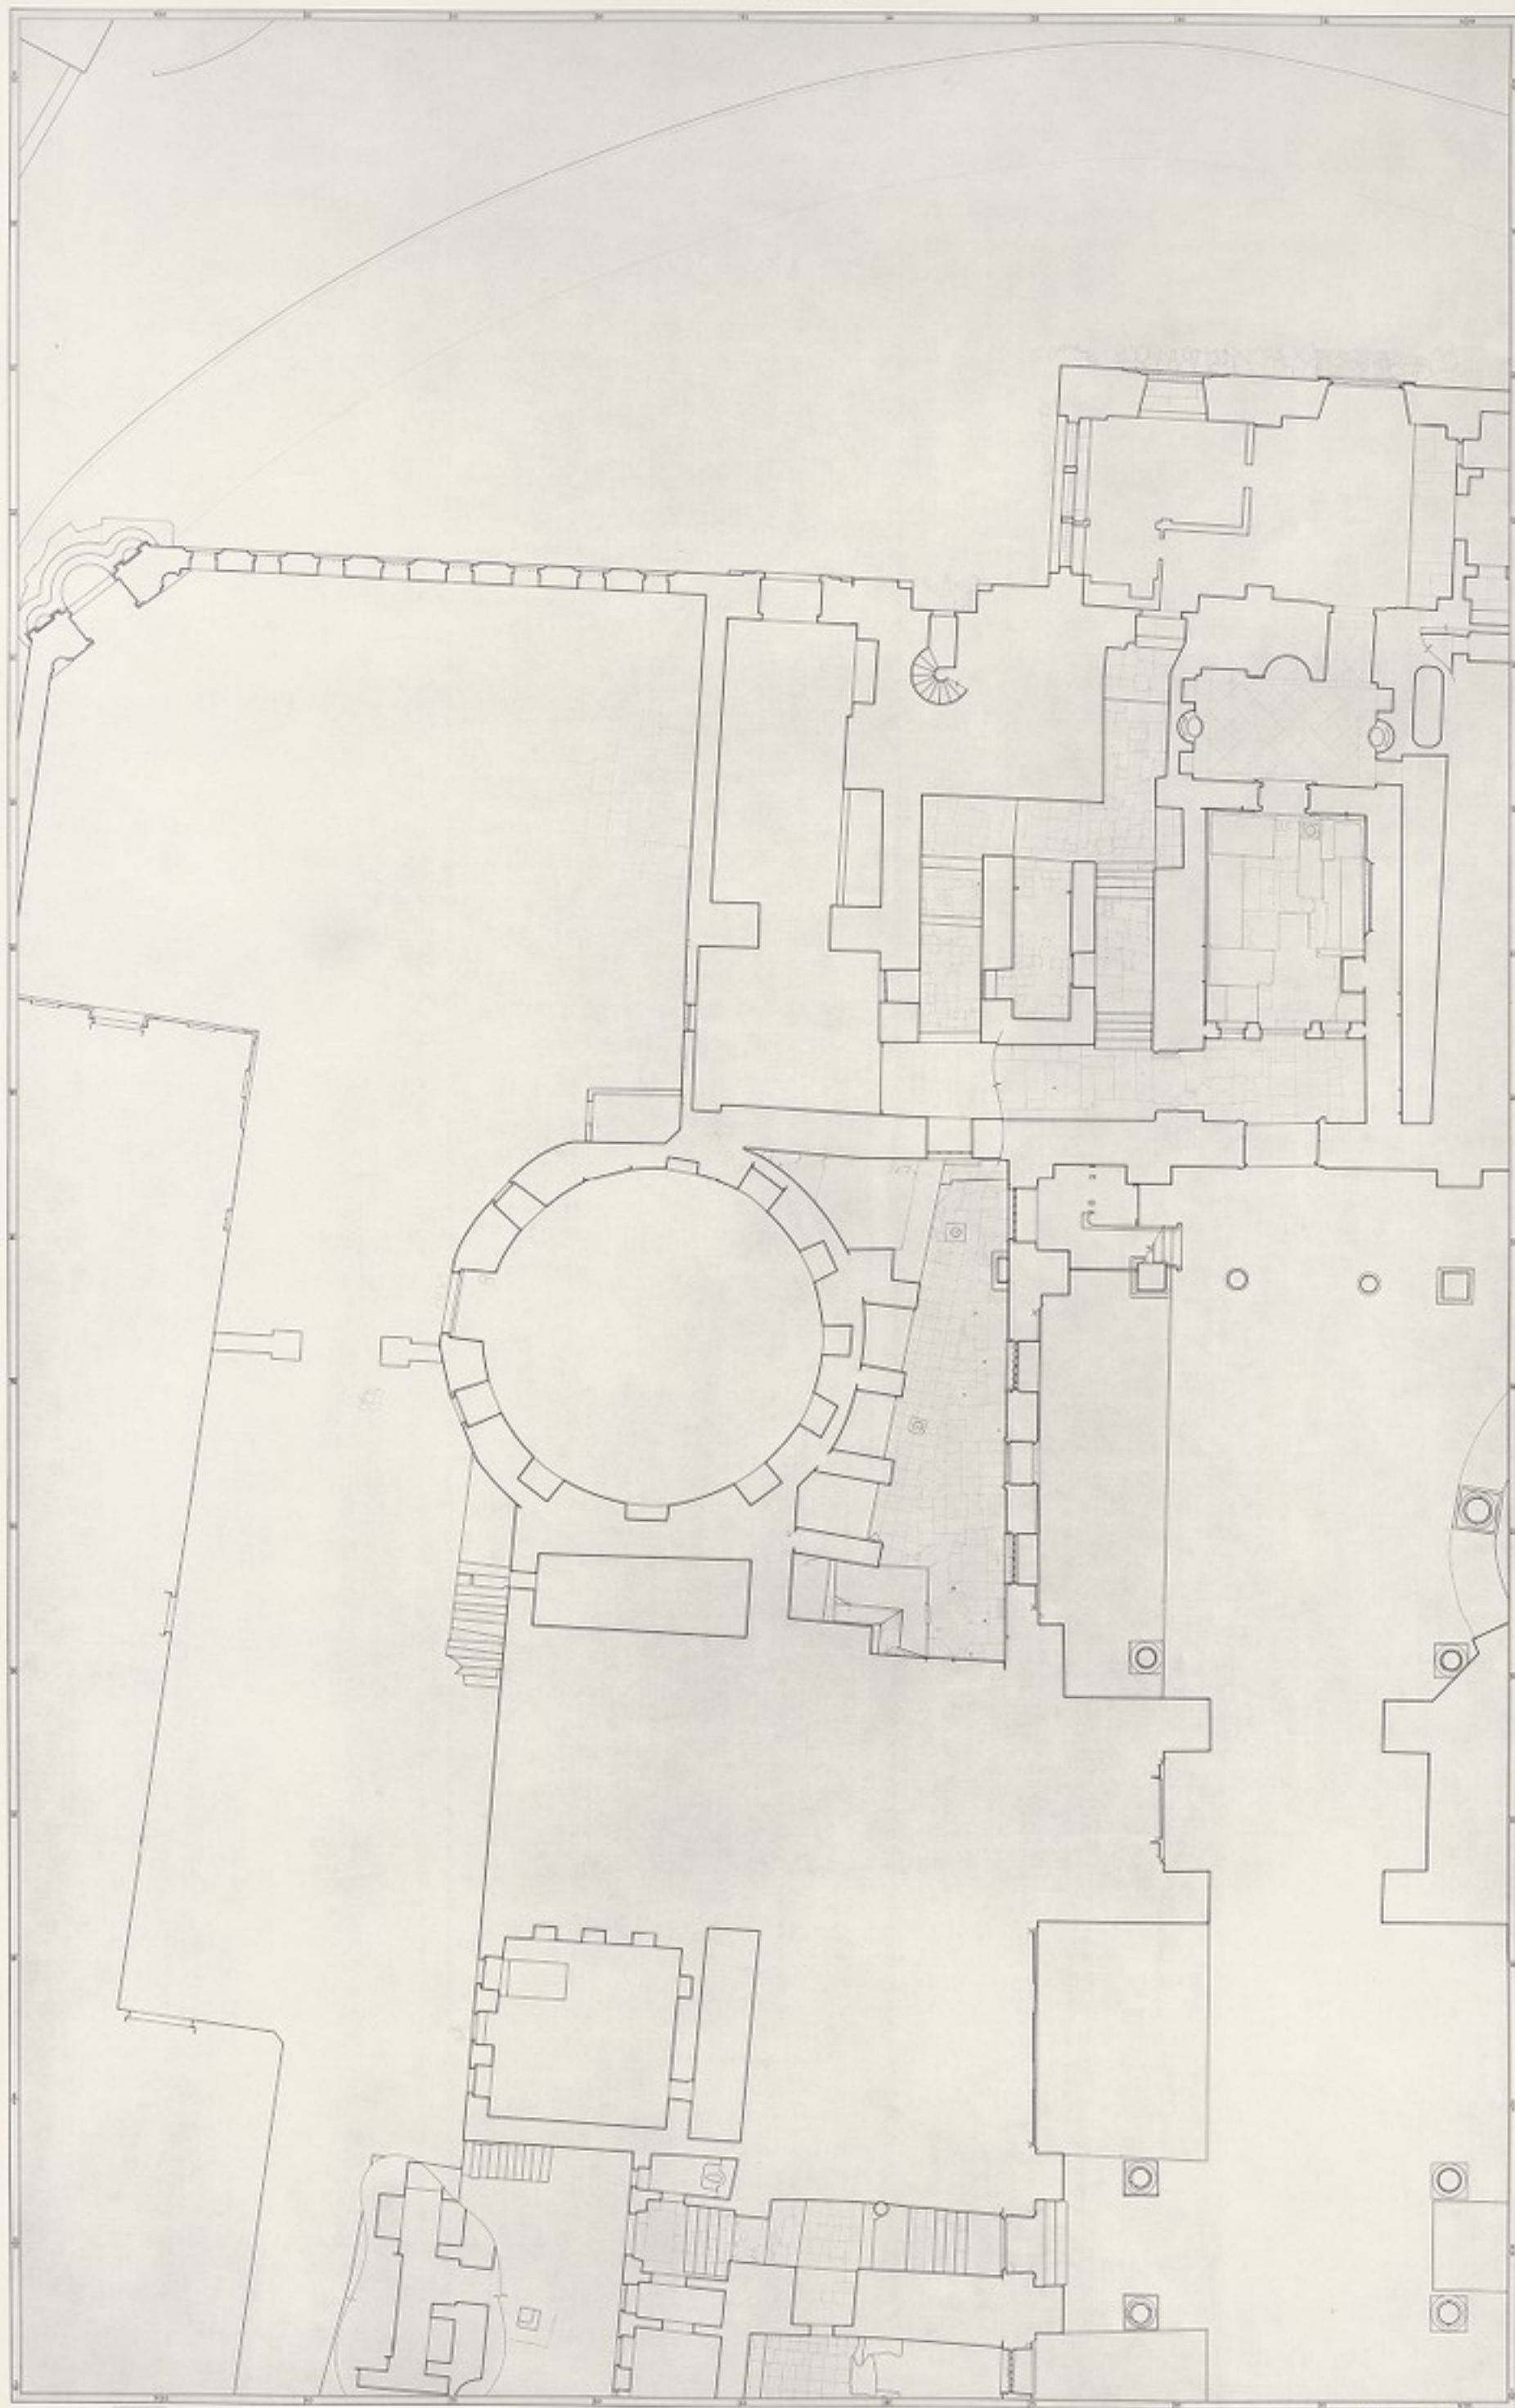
PLAN AT GROUND LEVEL, NORTHEASTERN EXTERIOR AREAS:
